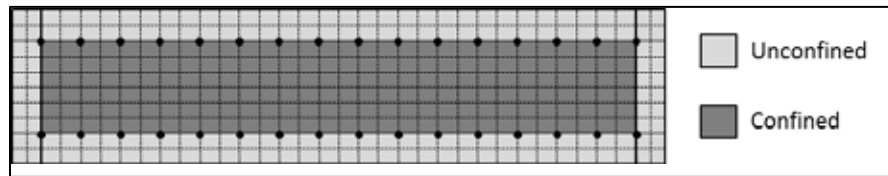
Fiber section for wall piers used with the prototype bridge.
